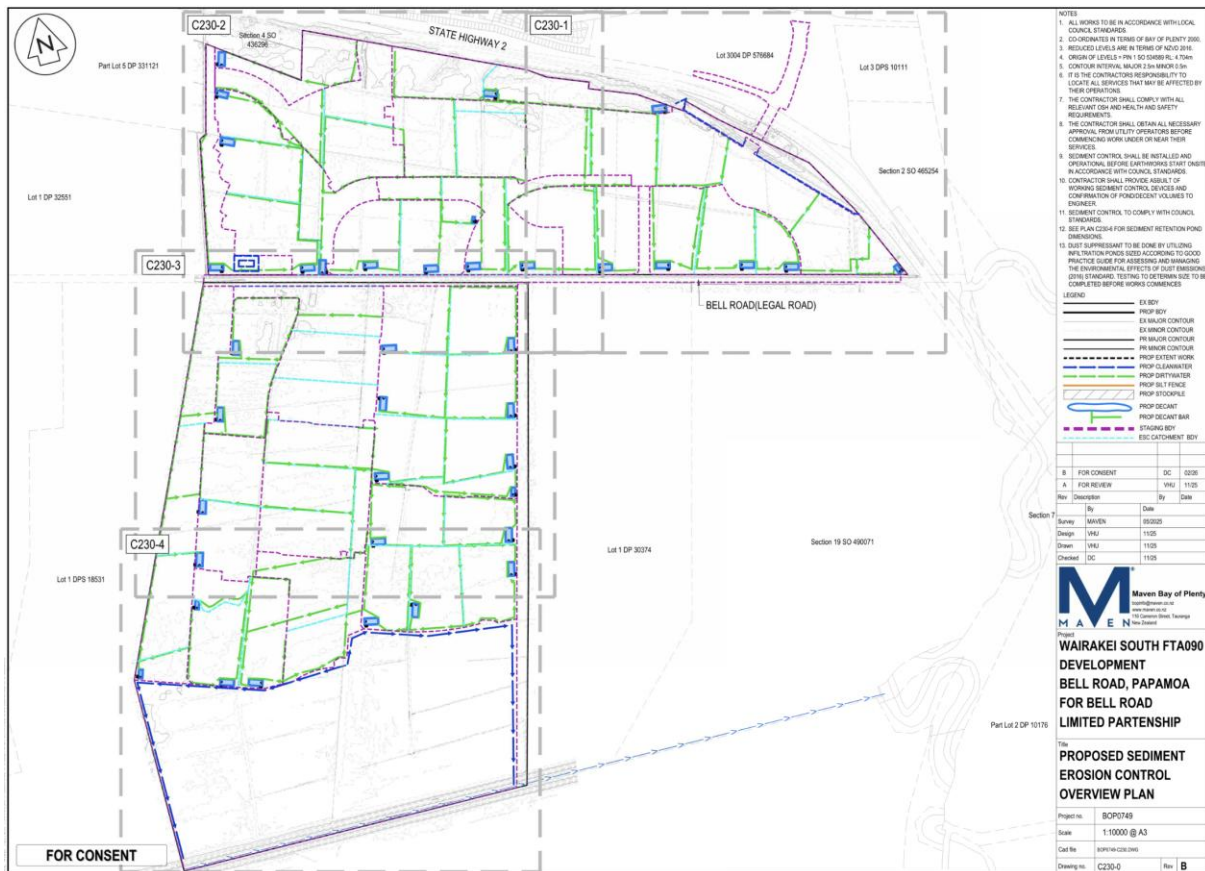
Proposed Sediment Erosion Control Overview Plan (Source: Engineering Drawings (Appendix D))
